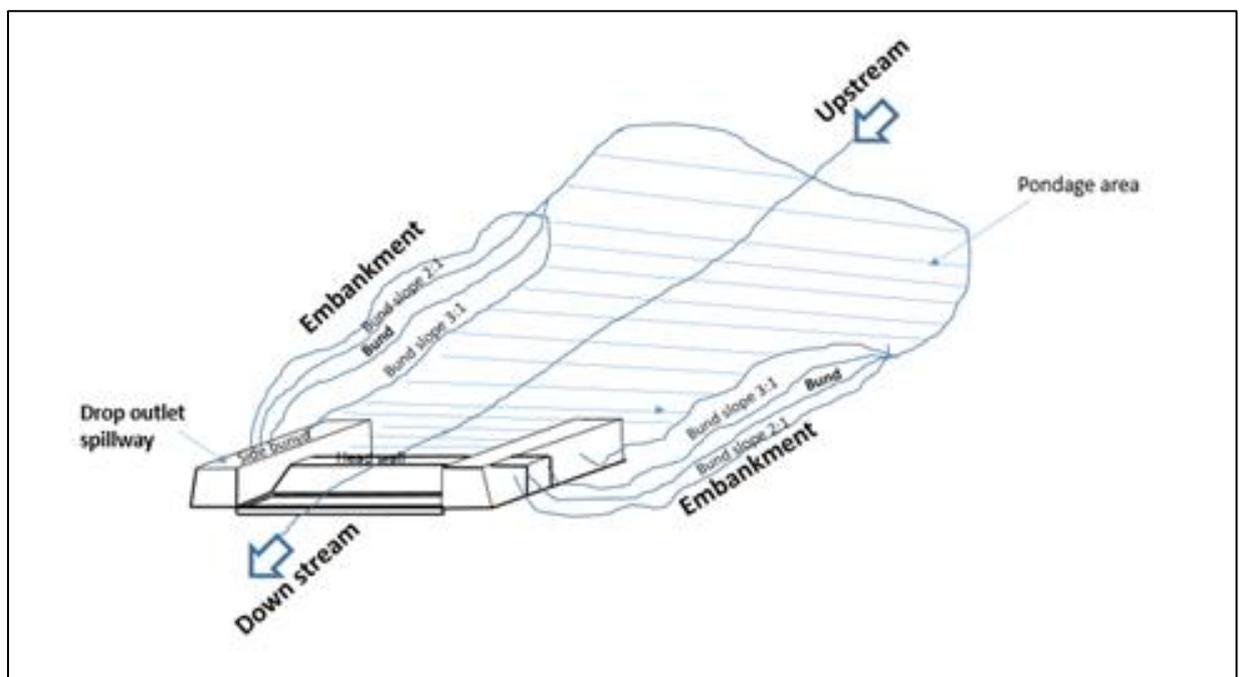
Embankment Pond with Drop outlet spillway to be constructed in the Kangsabati South Forest Division under JICA consultancy project at West Bengal
